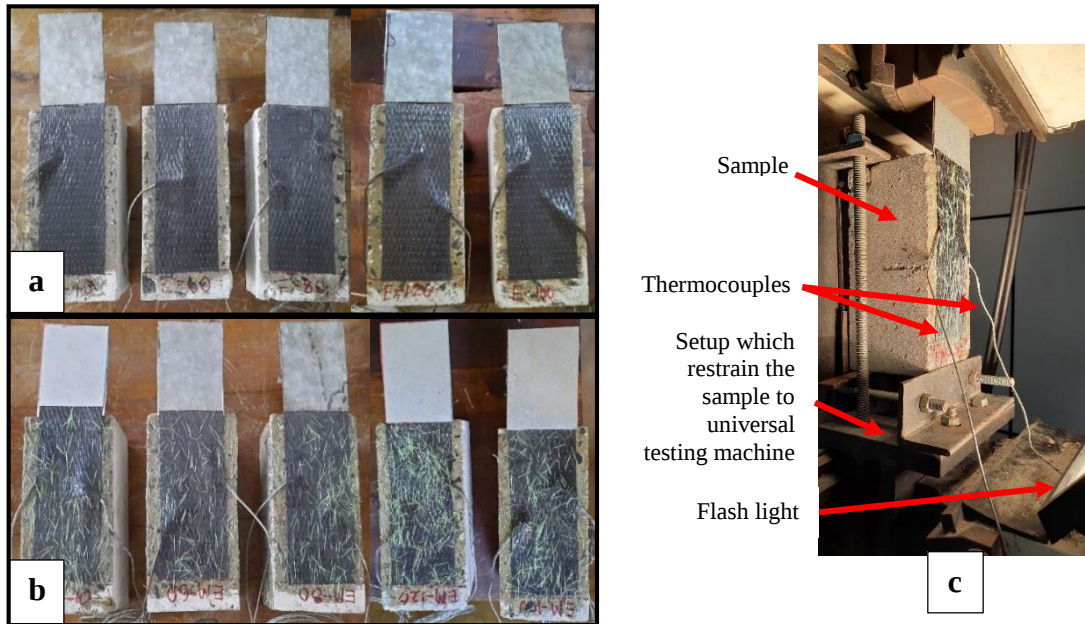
Samples fabricated by bonding CFRP using (a) epoxy adhesive (b) modified epoxy adhesive (c) Testing the sample
